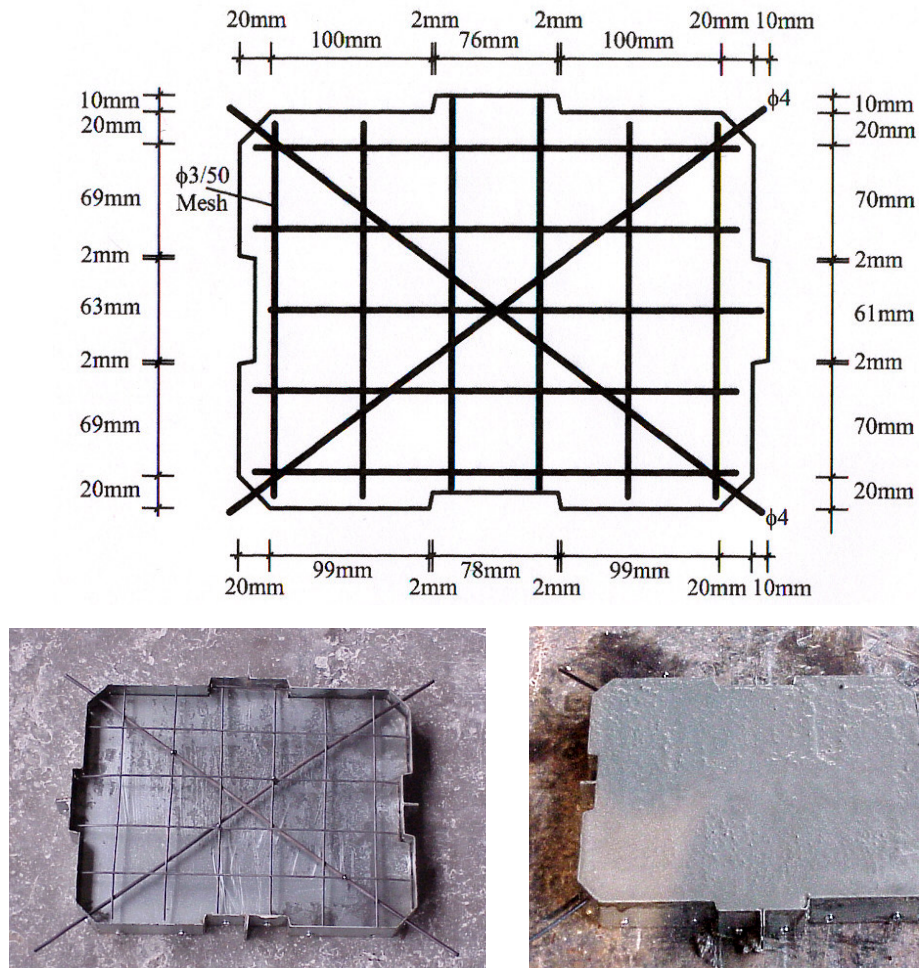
Dimension, reinforcement and moulding of Type A panels
